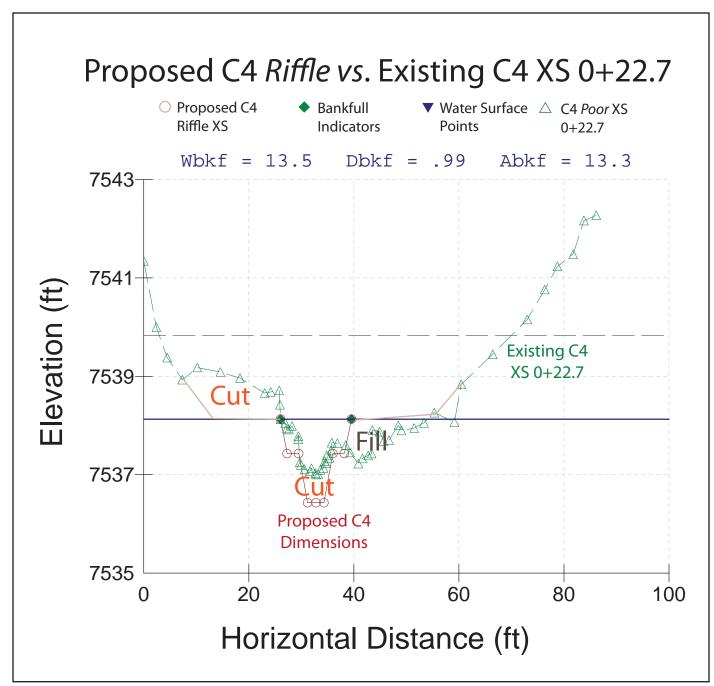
The proposed C4 *Stable riffle* cross-section compared to the existing C4 *Poor* cross-section 0+27 showing the cut and fill recommendations and reconnecting the channel with the floodplain.
